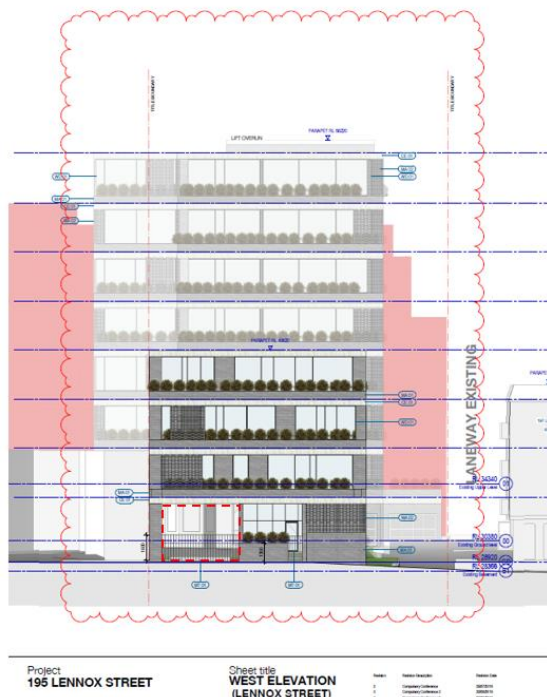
Front (west) Elevation to decision plans of Permit PLN17/1094
